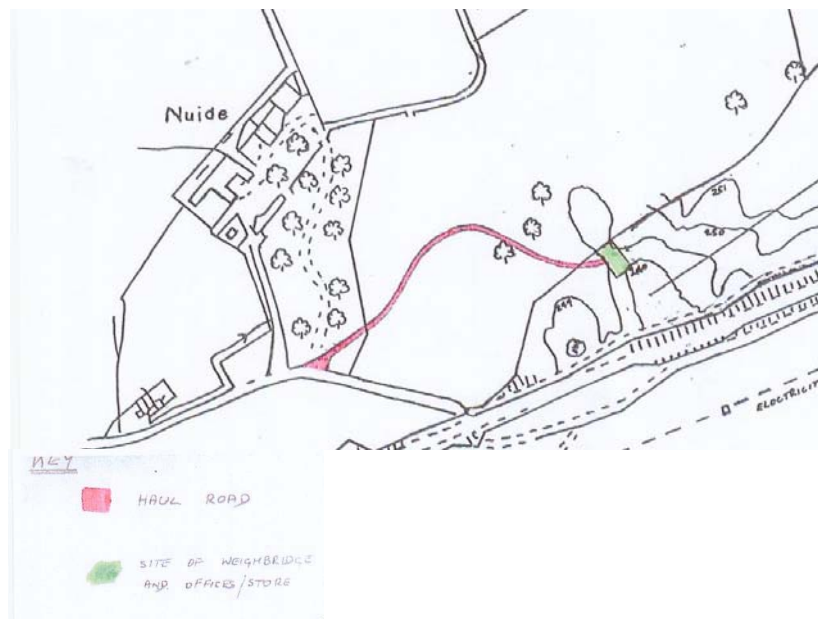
Proposed haul route and weighbridge and office / stores.
